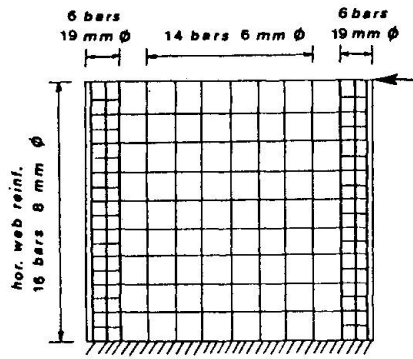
Reinforcement details of wall with strengthened compressive zone
